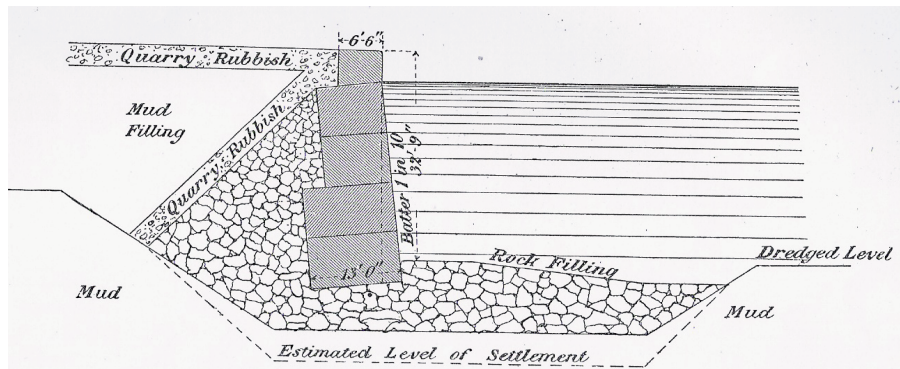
Cross-section of unreinforced concrete block wall structure, Bougie, Algeria, 1904 [Duplat Taylor 1949]
